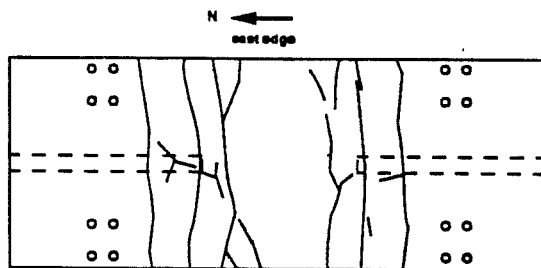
Sp. 2a: Progression of Cracking of Top Face of Roof Slab at End of Test
